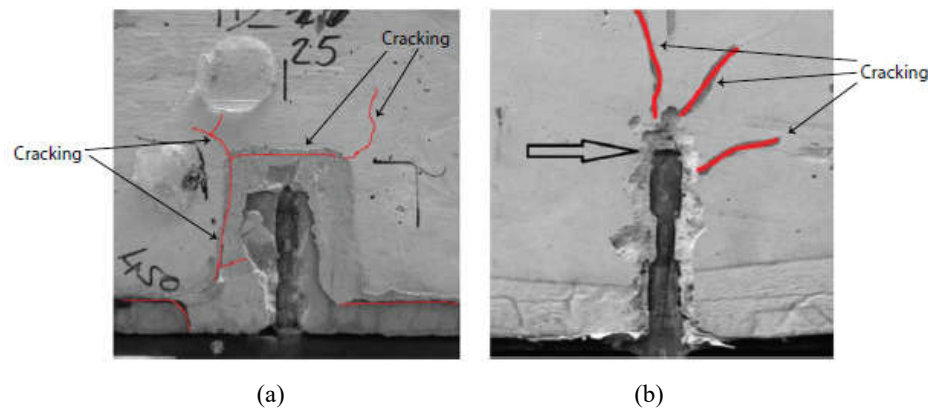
(a) Precast slab connection; (b) Cast-in-place slab connection (Diógenes *et al.*, 2018).
